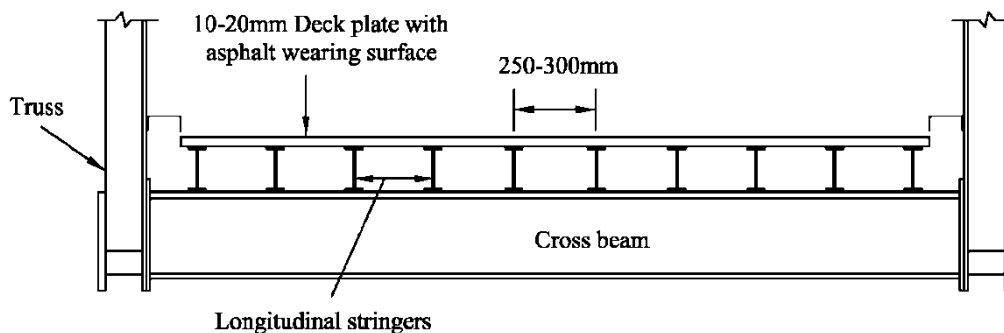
Typical cross-section of bridge with “battledeck” floor^[1]
